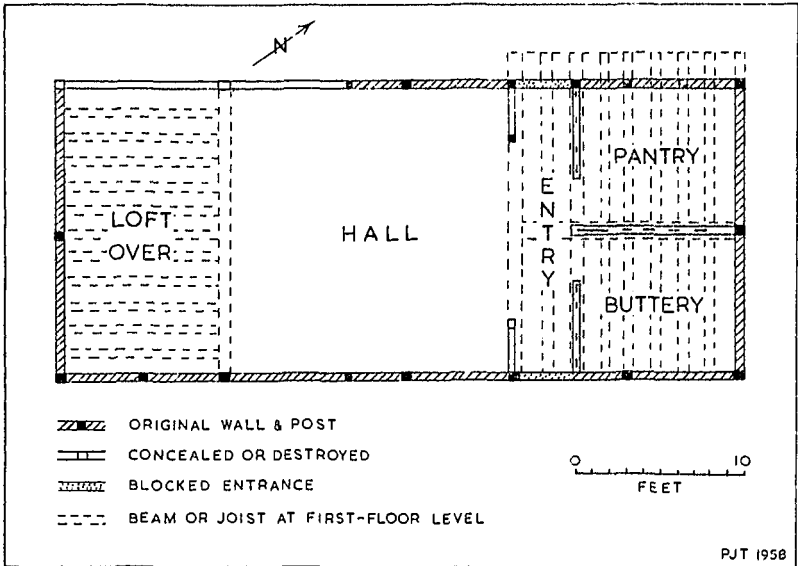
Sketch-plan to illustrate the original layout of a timber hall-house at Halfway Street, Sidcup. All later features omitted.
